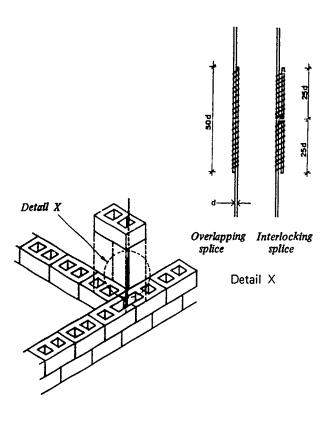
Vertical bars in hollow concrete blocks and their splicing
